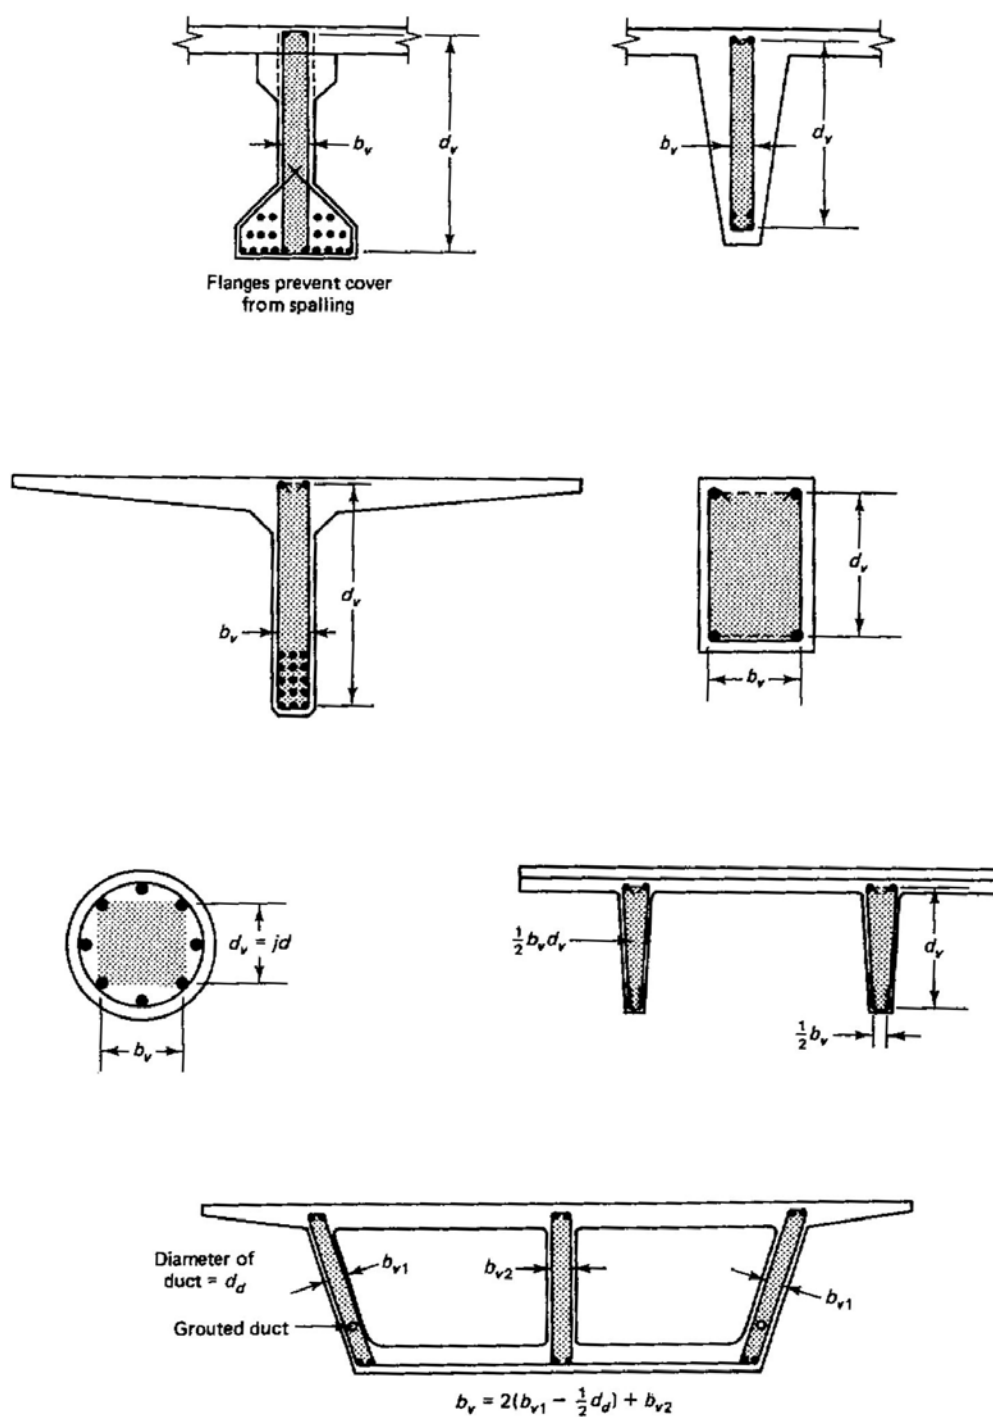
Effective shear width and depth of typical prestressed concrete sections.
